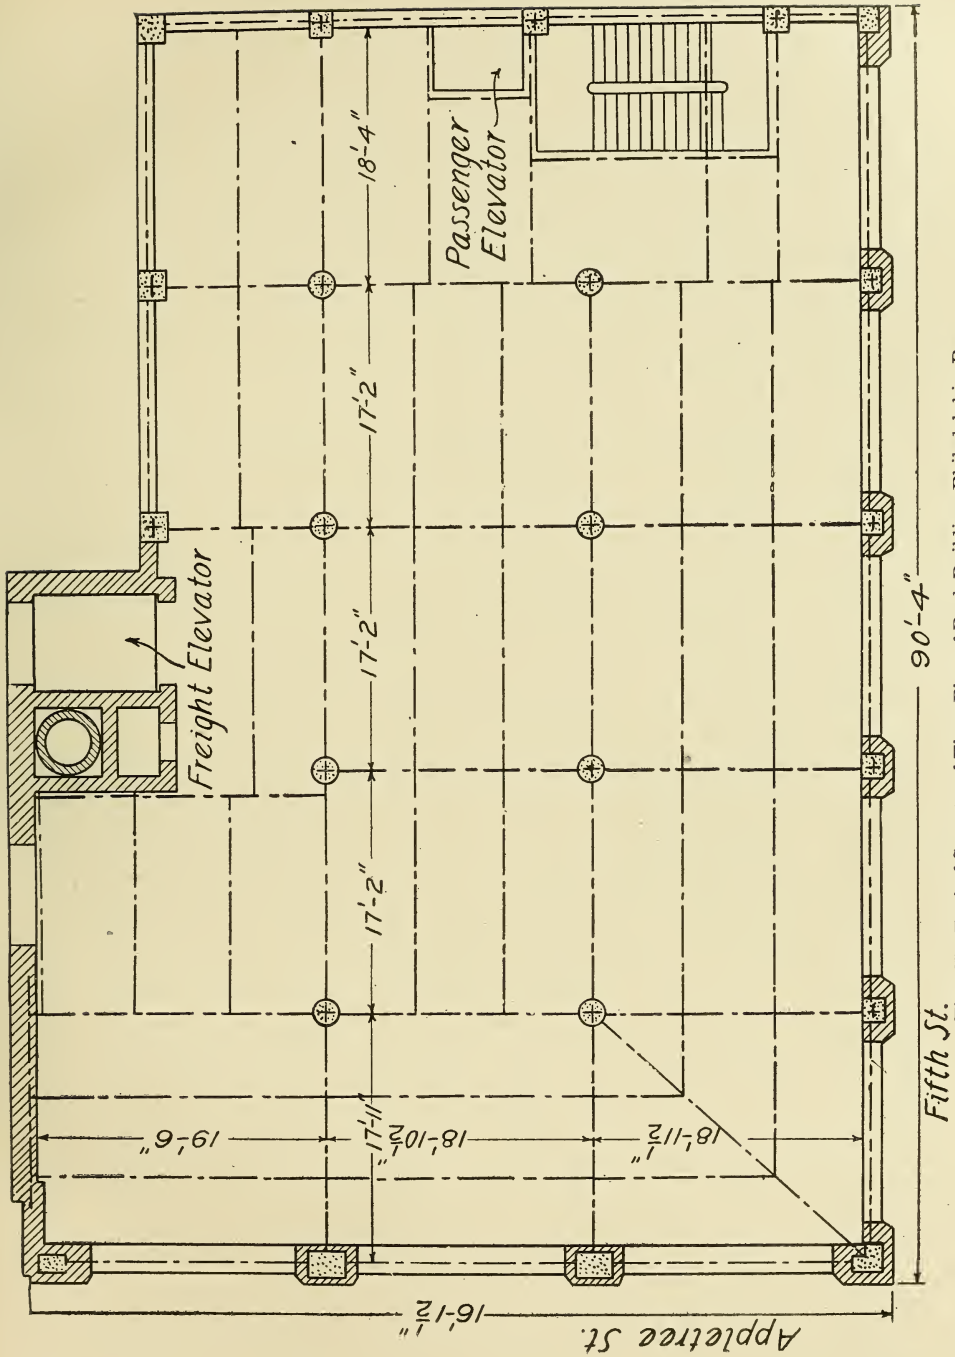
Typical Structural Floor-Plan of Buck Building, Philadelphia, Pa.
